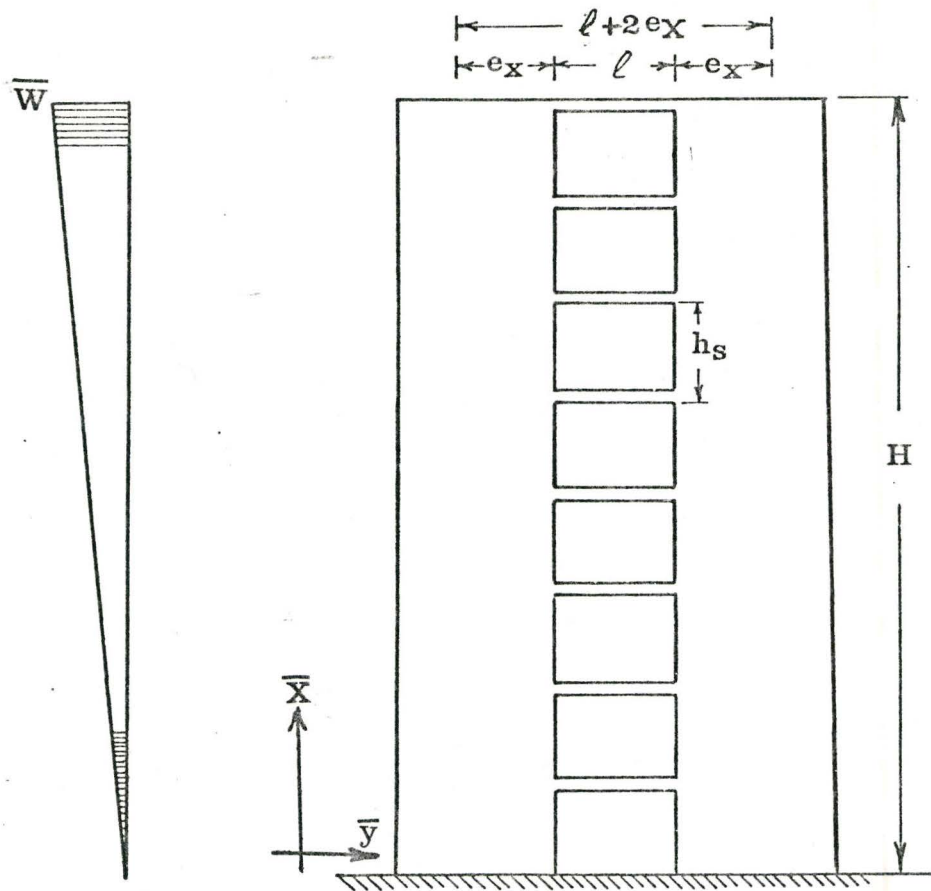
Coupled Shear Wall under Lateral Loading.
